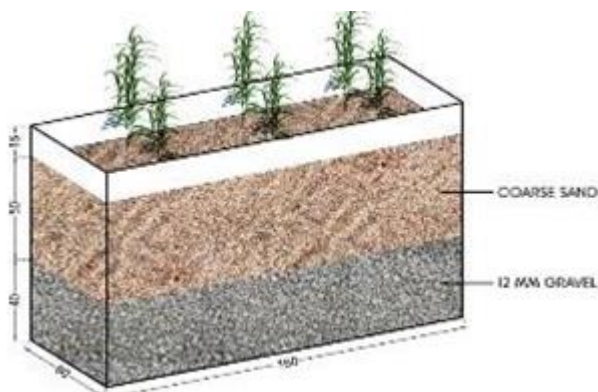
Figure 3: 3D cross Section of the SSVF CW Planted bed
